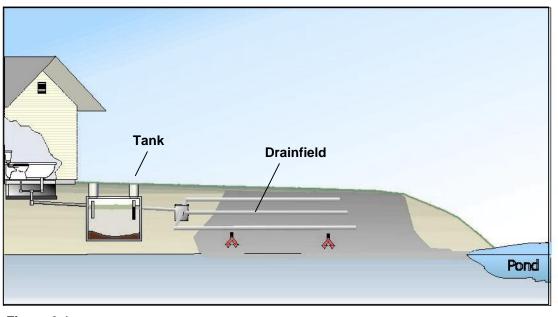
Conventional Septic System with Septic Tank and Trench Drainfield
